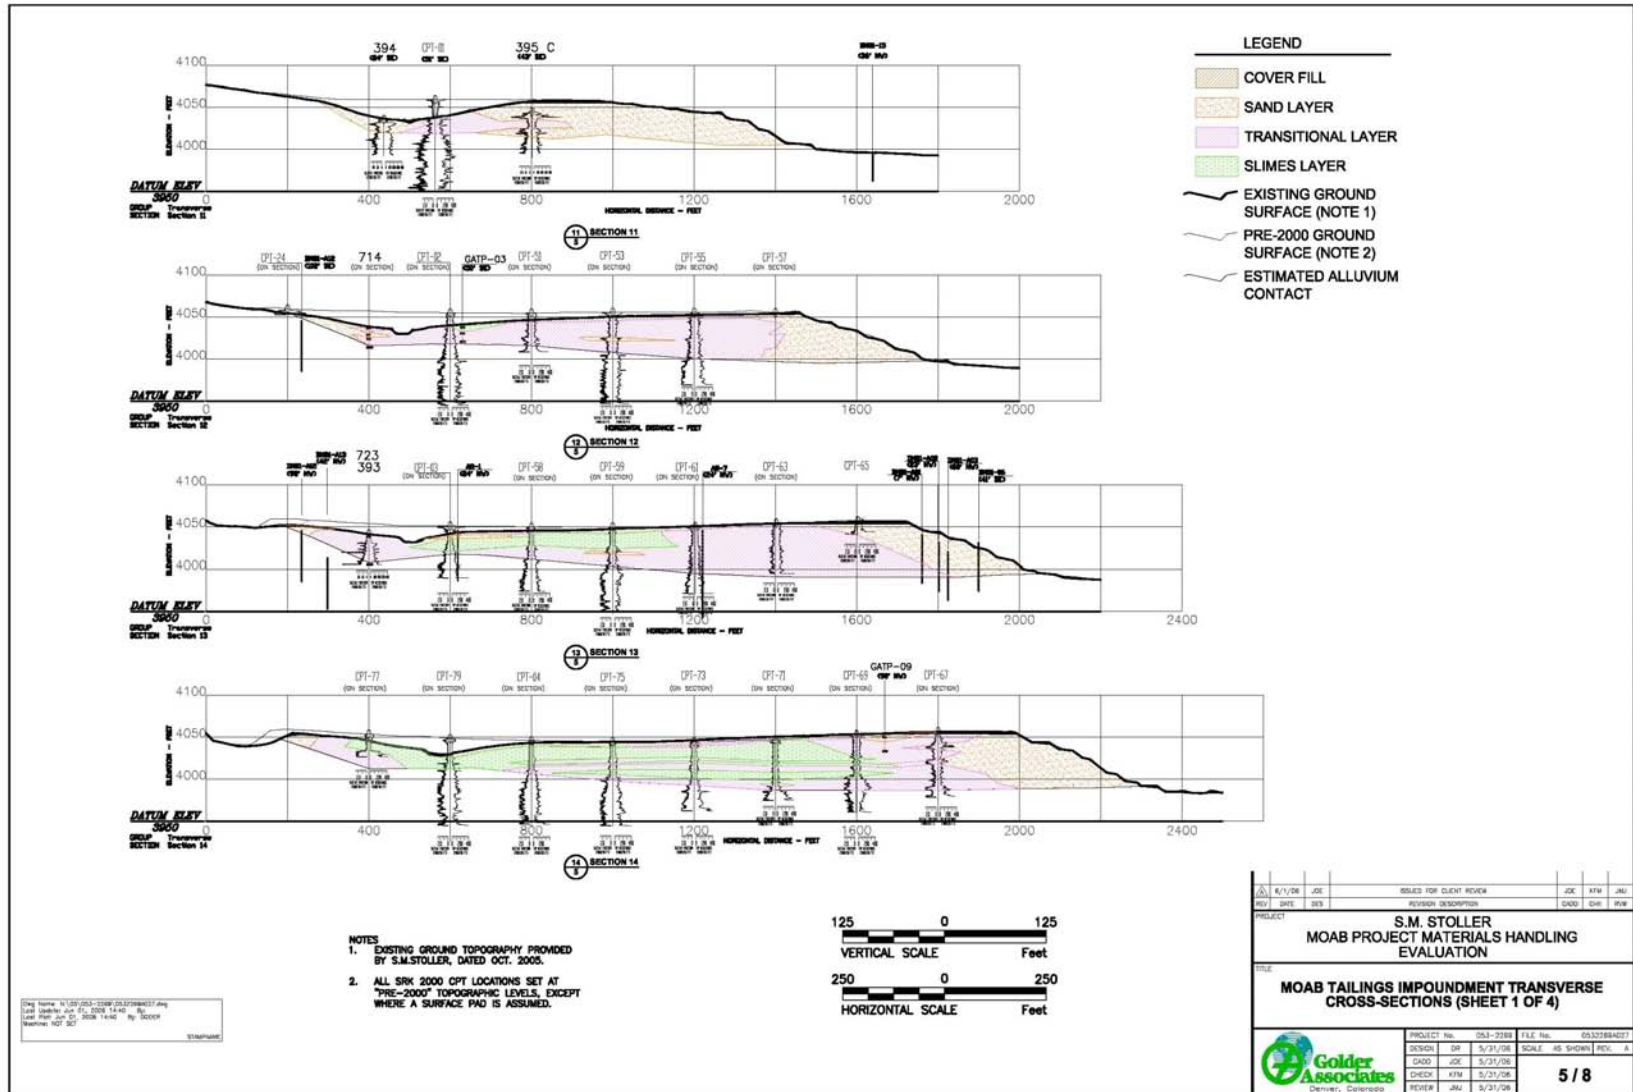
Moab Tailings Impoundment Transverse Cross Sections (Sheet 1 of 4)
